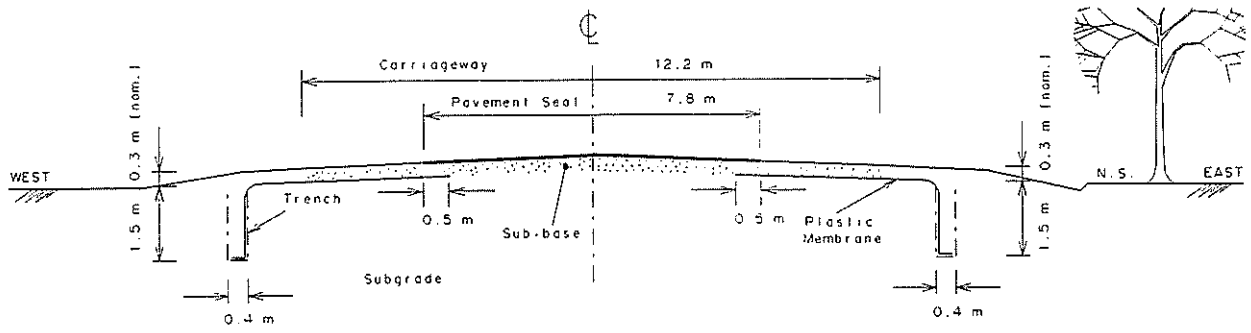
Typical Cross-Section of Test Section (First Field Trial)
